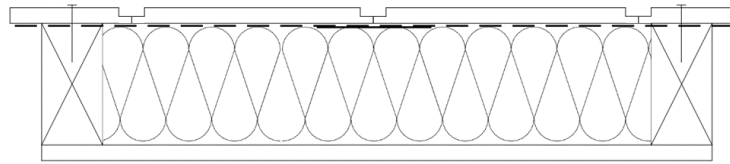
Hardboard sheet cladding Vertical Joint with metal joiner
